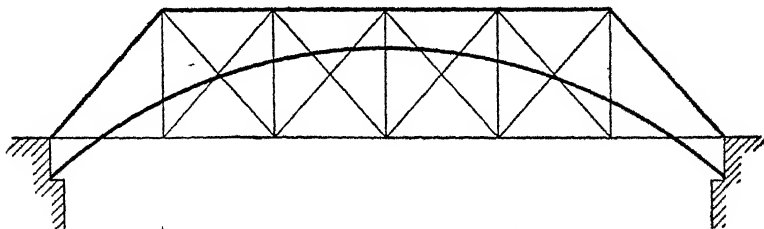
King-Post Truss Bridge Stiffened by Arch.
